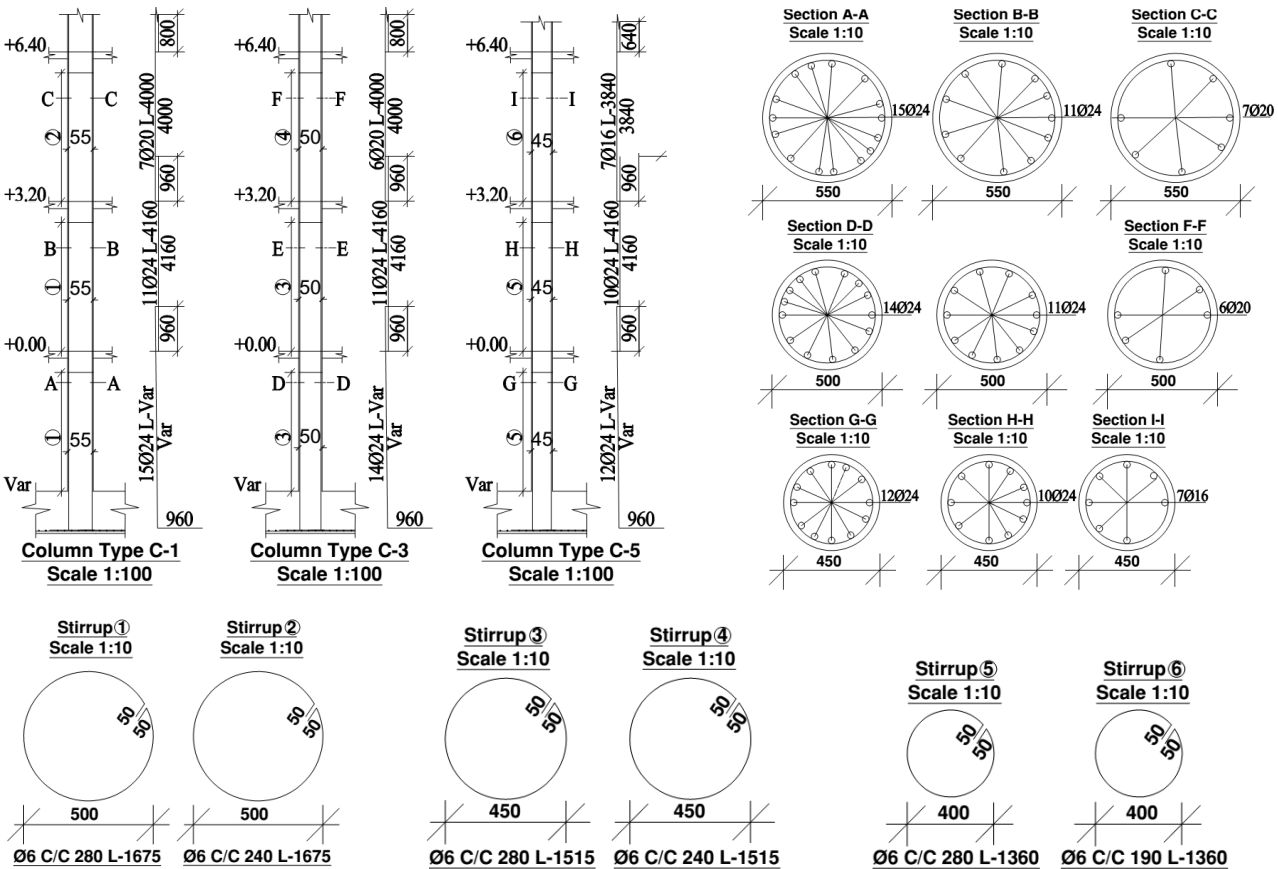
Sample column detailing for G+7 building with C-40 concrete
